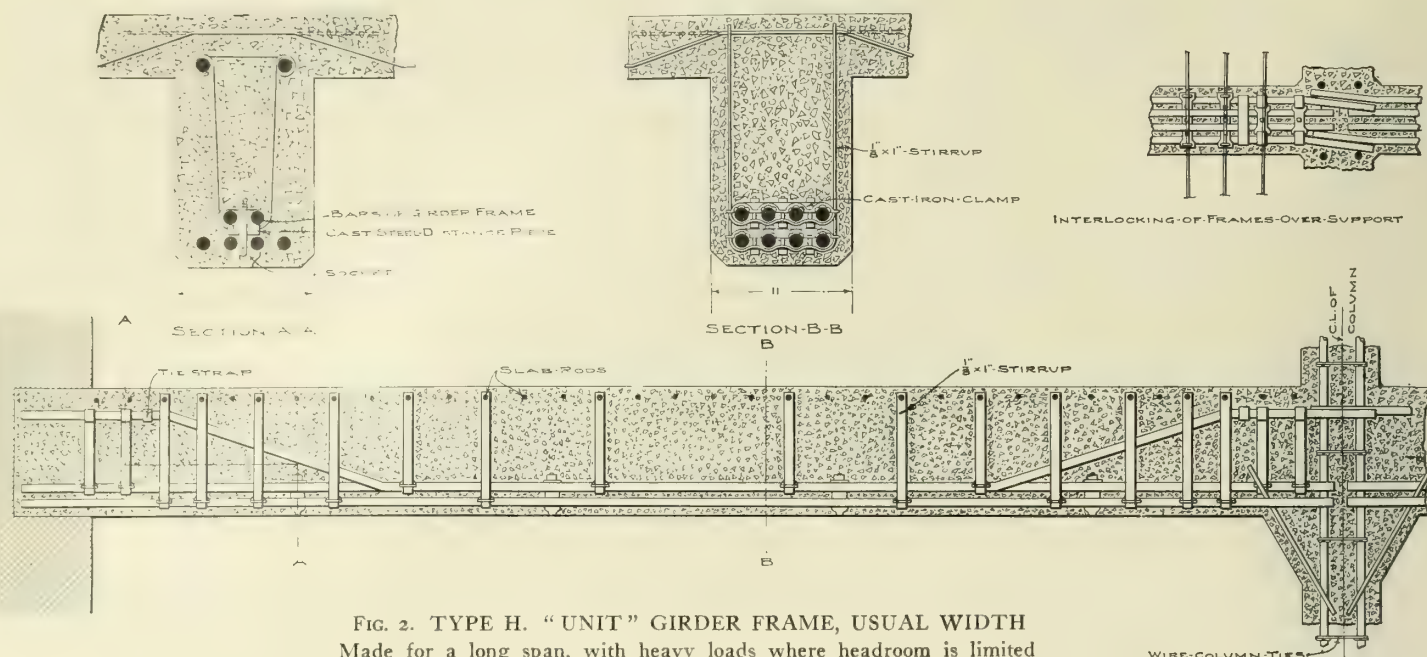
TYPE H. "UNIT" GIRDER FRAME, USUAL WIDTH
